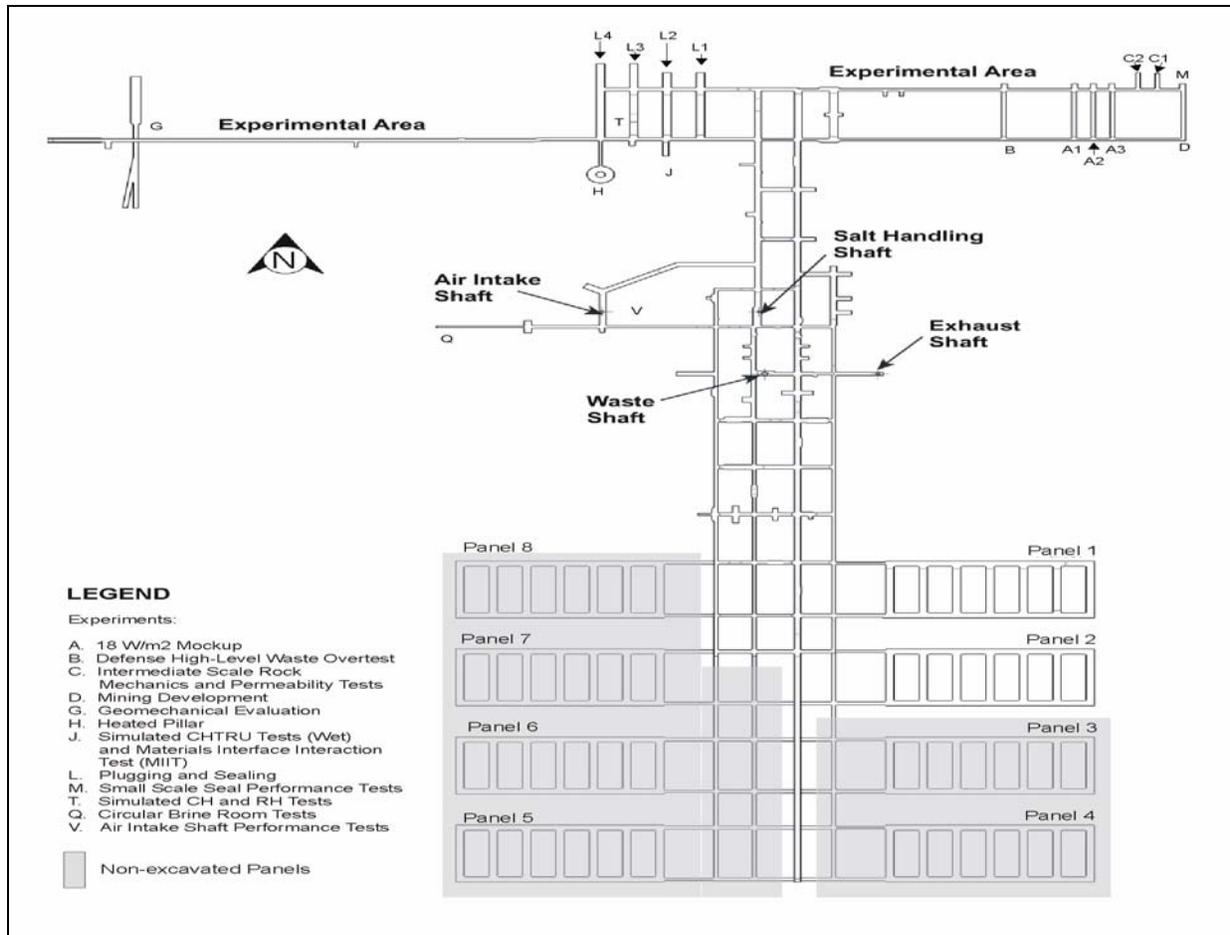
Layout of underground facilities and locations of large-scale in situ tests.
